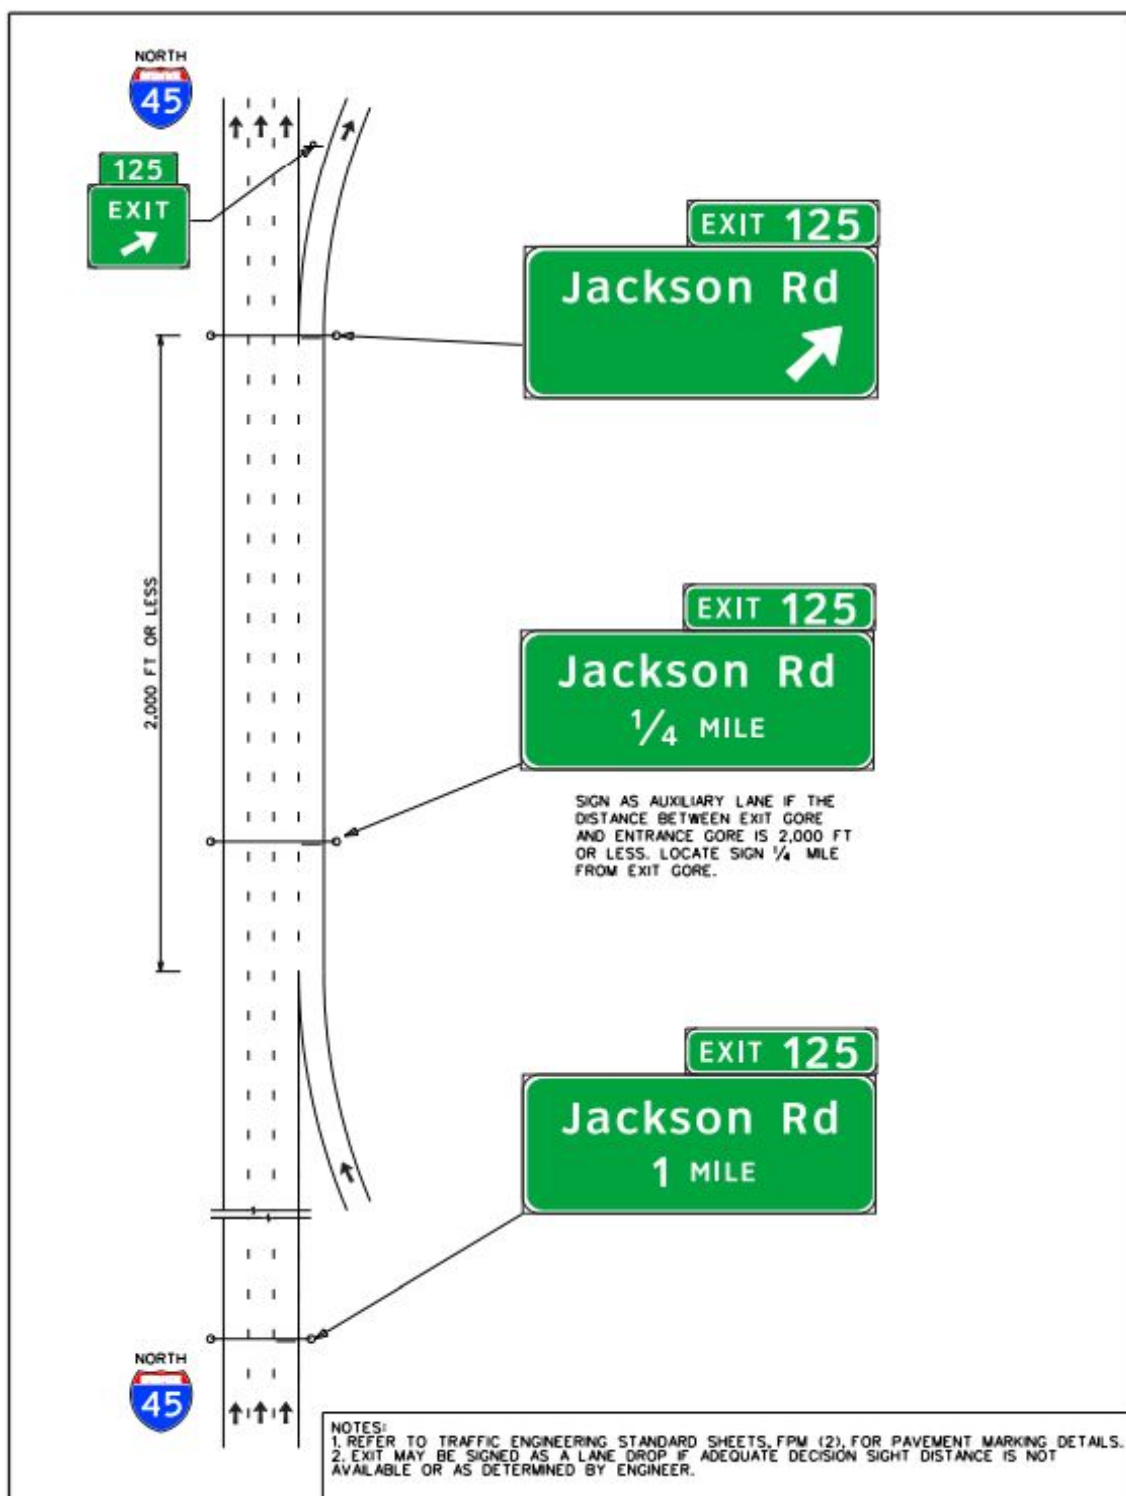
Closely spaced ramps with an added-lane entrance ramp and a lane drop exit ramp and 2000 ft or less between exit and entrance ramp gores.
